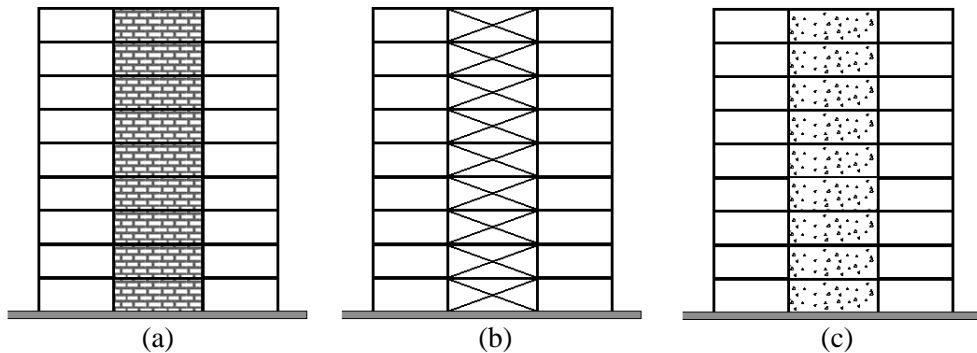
Added different lateral load resisting systems considered in this study. (a), (b) and (c) are masonry infills, steel bracing and reinforced concrete infills, respectively.
